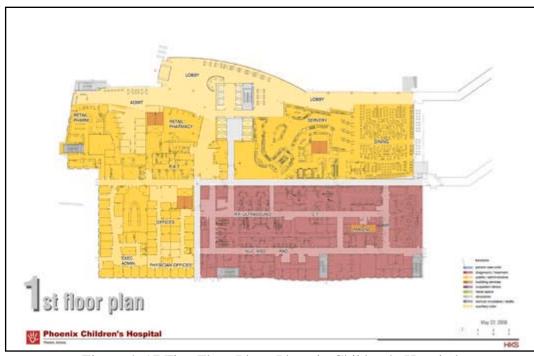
17 First Floor Plan, Phoenix Children's Hospital
